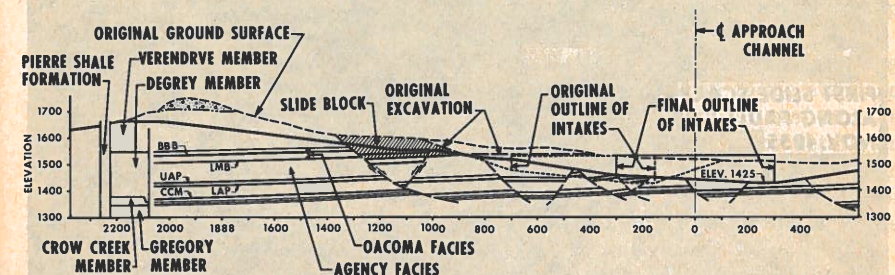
SLOPE LANDWARD FROM OUTLET WORKS INTAKES
